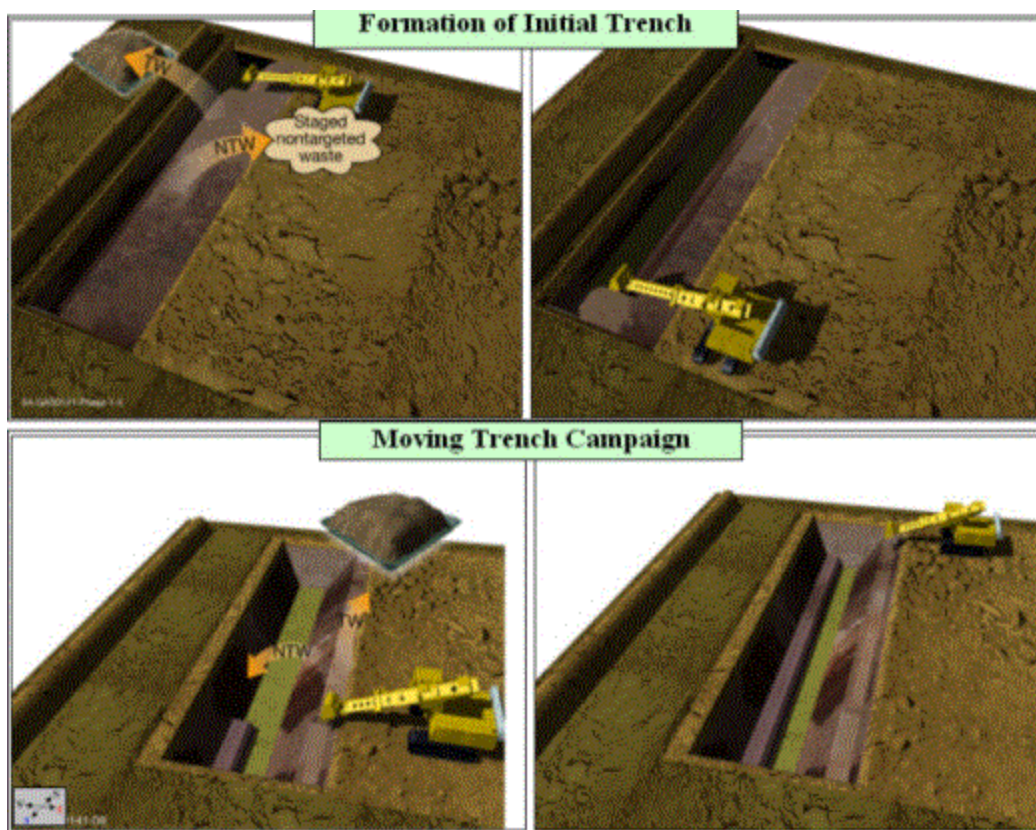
Initial Trench and Moving Trench Waste Excavation Campaigns
